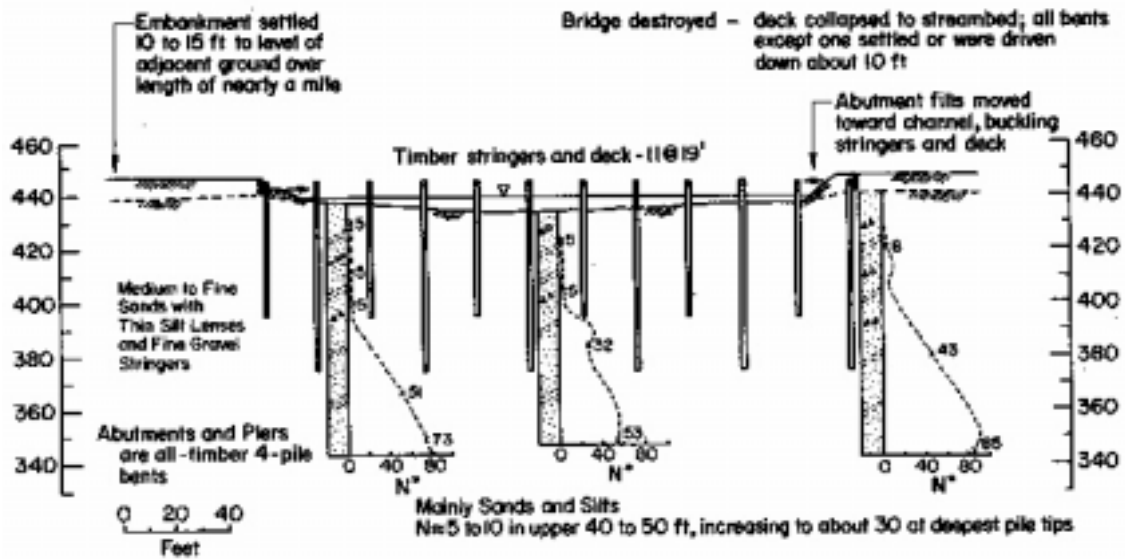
Bridge 605, Snow River 3. Centerline Section Looking Downstream (Natural Scale)
